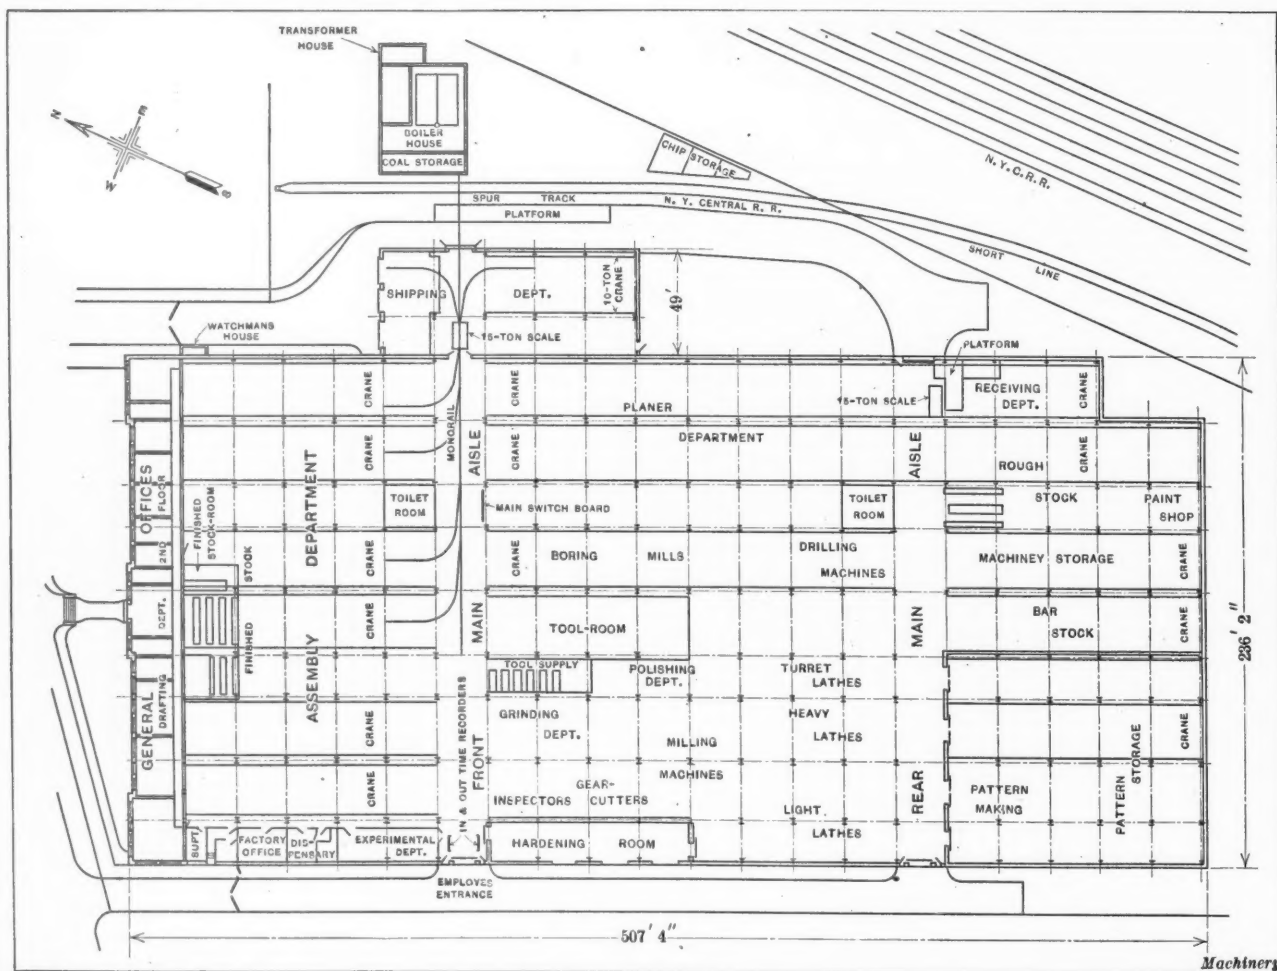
Plan View of the Foote-Burt Co.'s New Plant in Cleveland, Ohio
